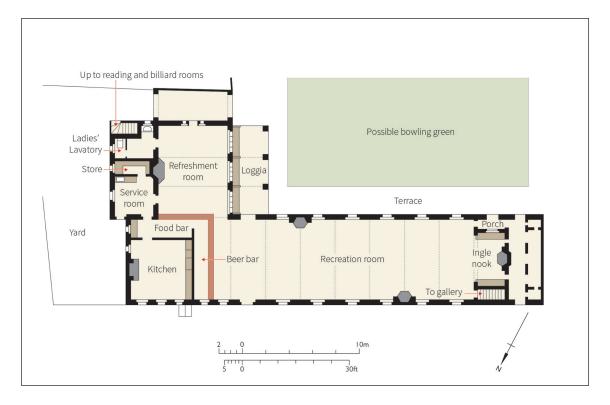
Ground-floor plan of the Globe Tavern, High Street/ Bank Street, Longtown as constructed 1917 (© Historic England, drawn by John Vallender, 2017)
